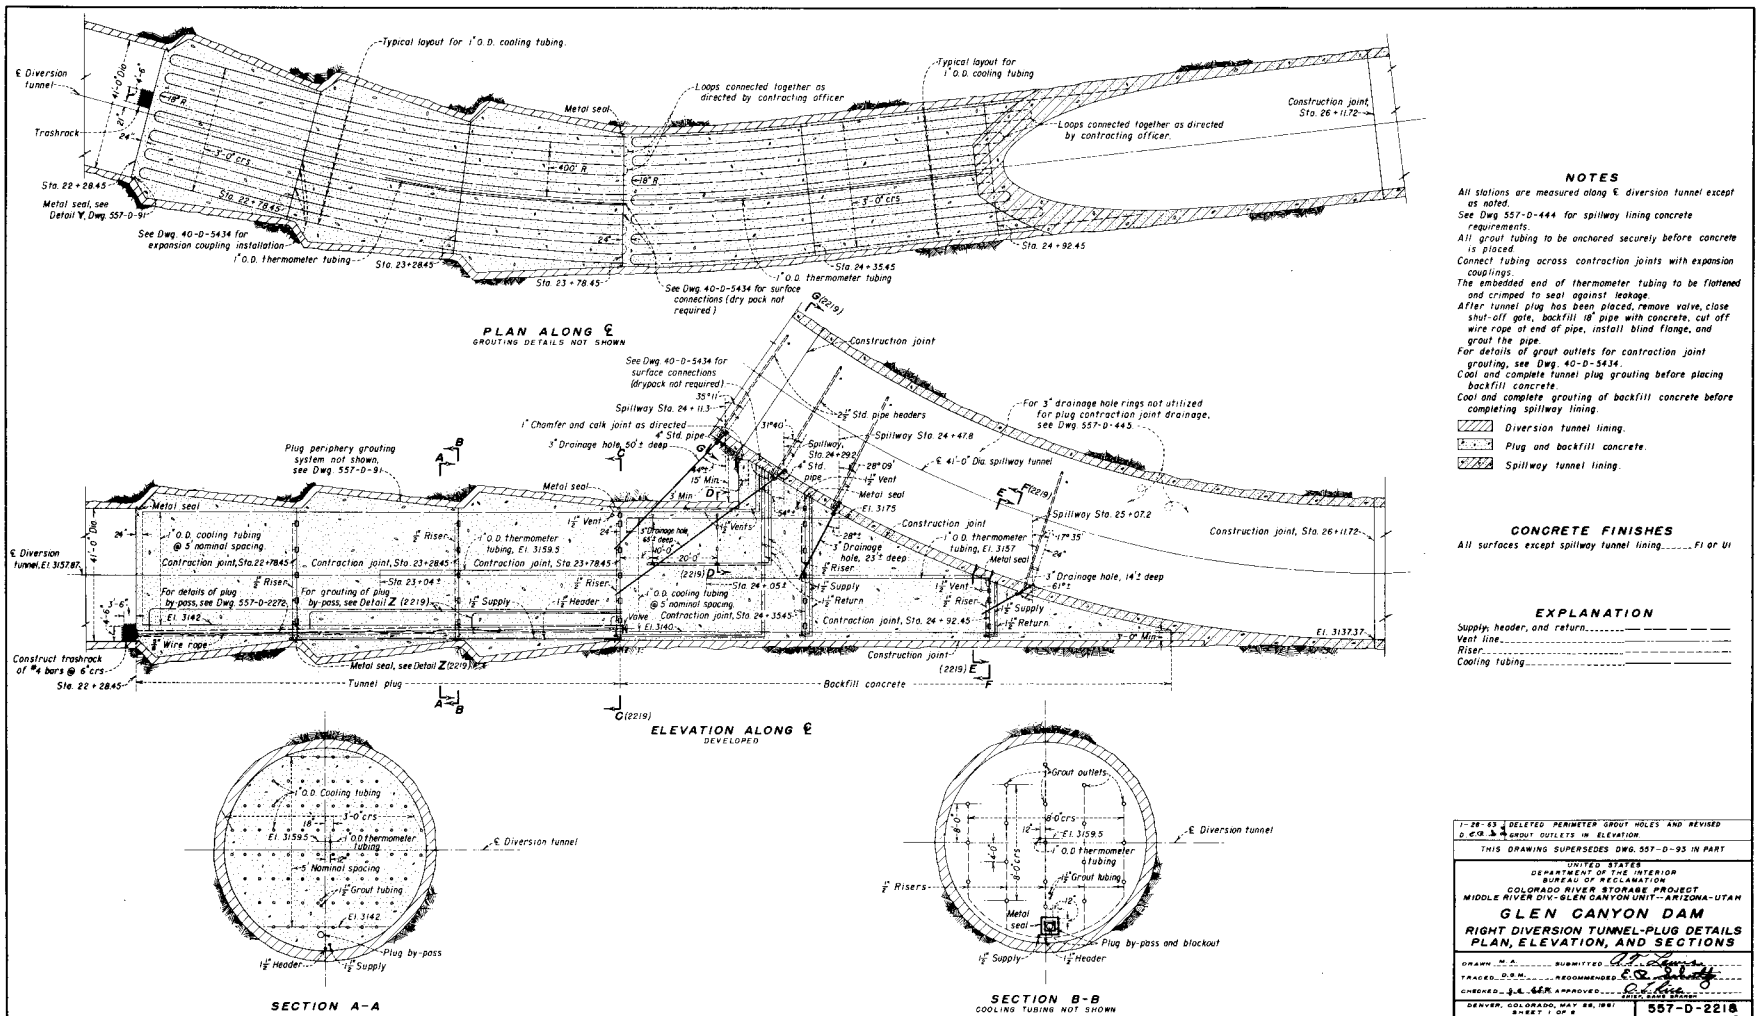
Right diversion tunnel plug details—Plan, elevation, and sections. (Sheet 1 of 2.)
